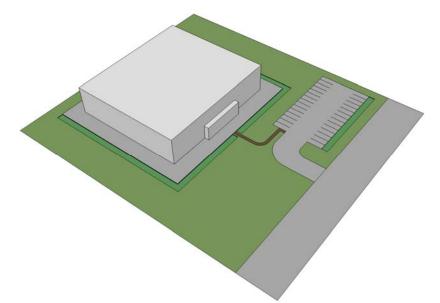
Commercial area in which impervious surfaces have been disconnected. Runoff from the roof and sidewalk are captured by bioretention cells. Sidewalks are separated from the parking lot by a large vegetated area. The parking lot drains to a bioretention cell rather than directly to the street. Source: The Low Impact Development Center, Inc.
